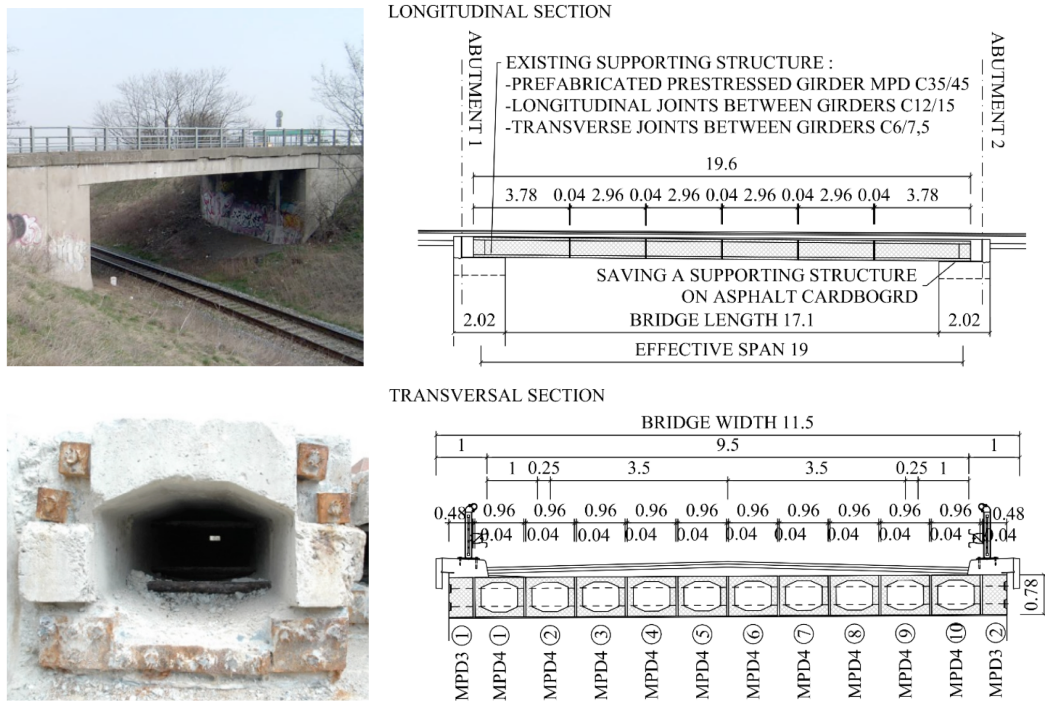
Views, longitudinal and transverse sections of the analyzed bridge
